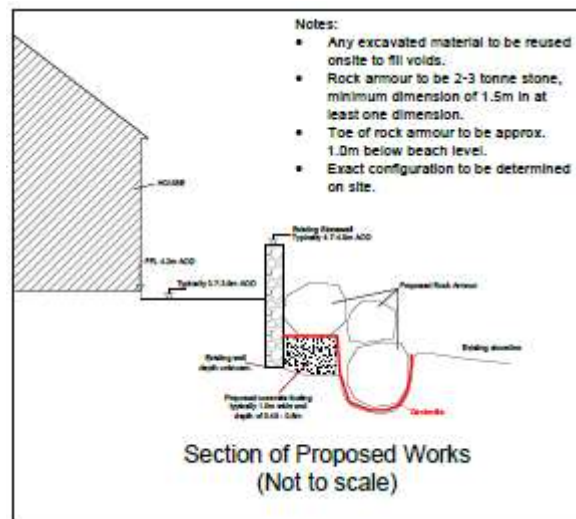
Extract from Drawing No. CE-2023-03-01 Rev. A
